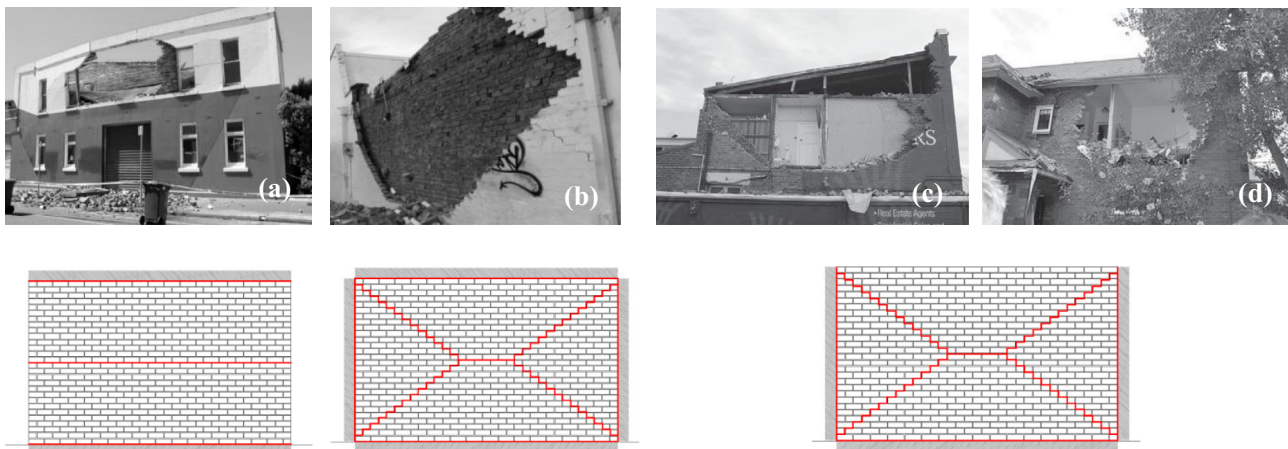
One-way bending failure (a), two-way failure (b), top portion cantilever wall failure (c, d) (adapted from Dizhur et al. [2]).
